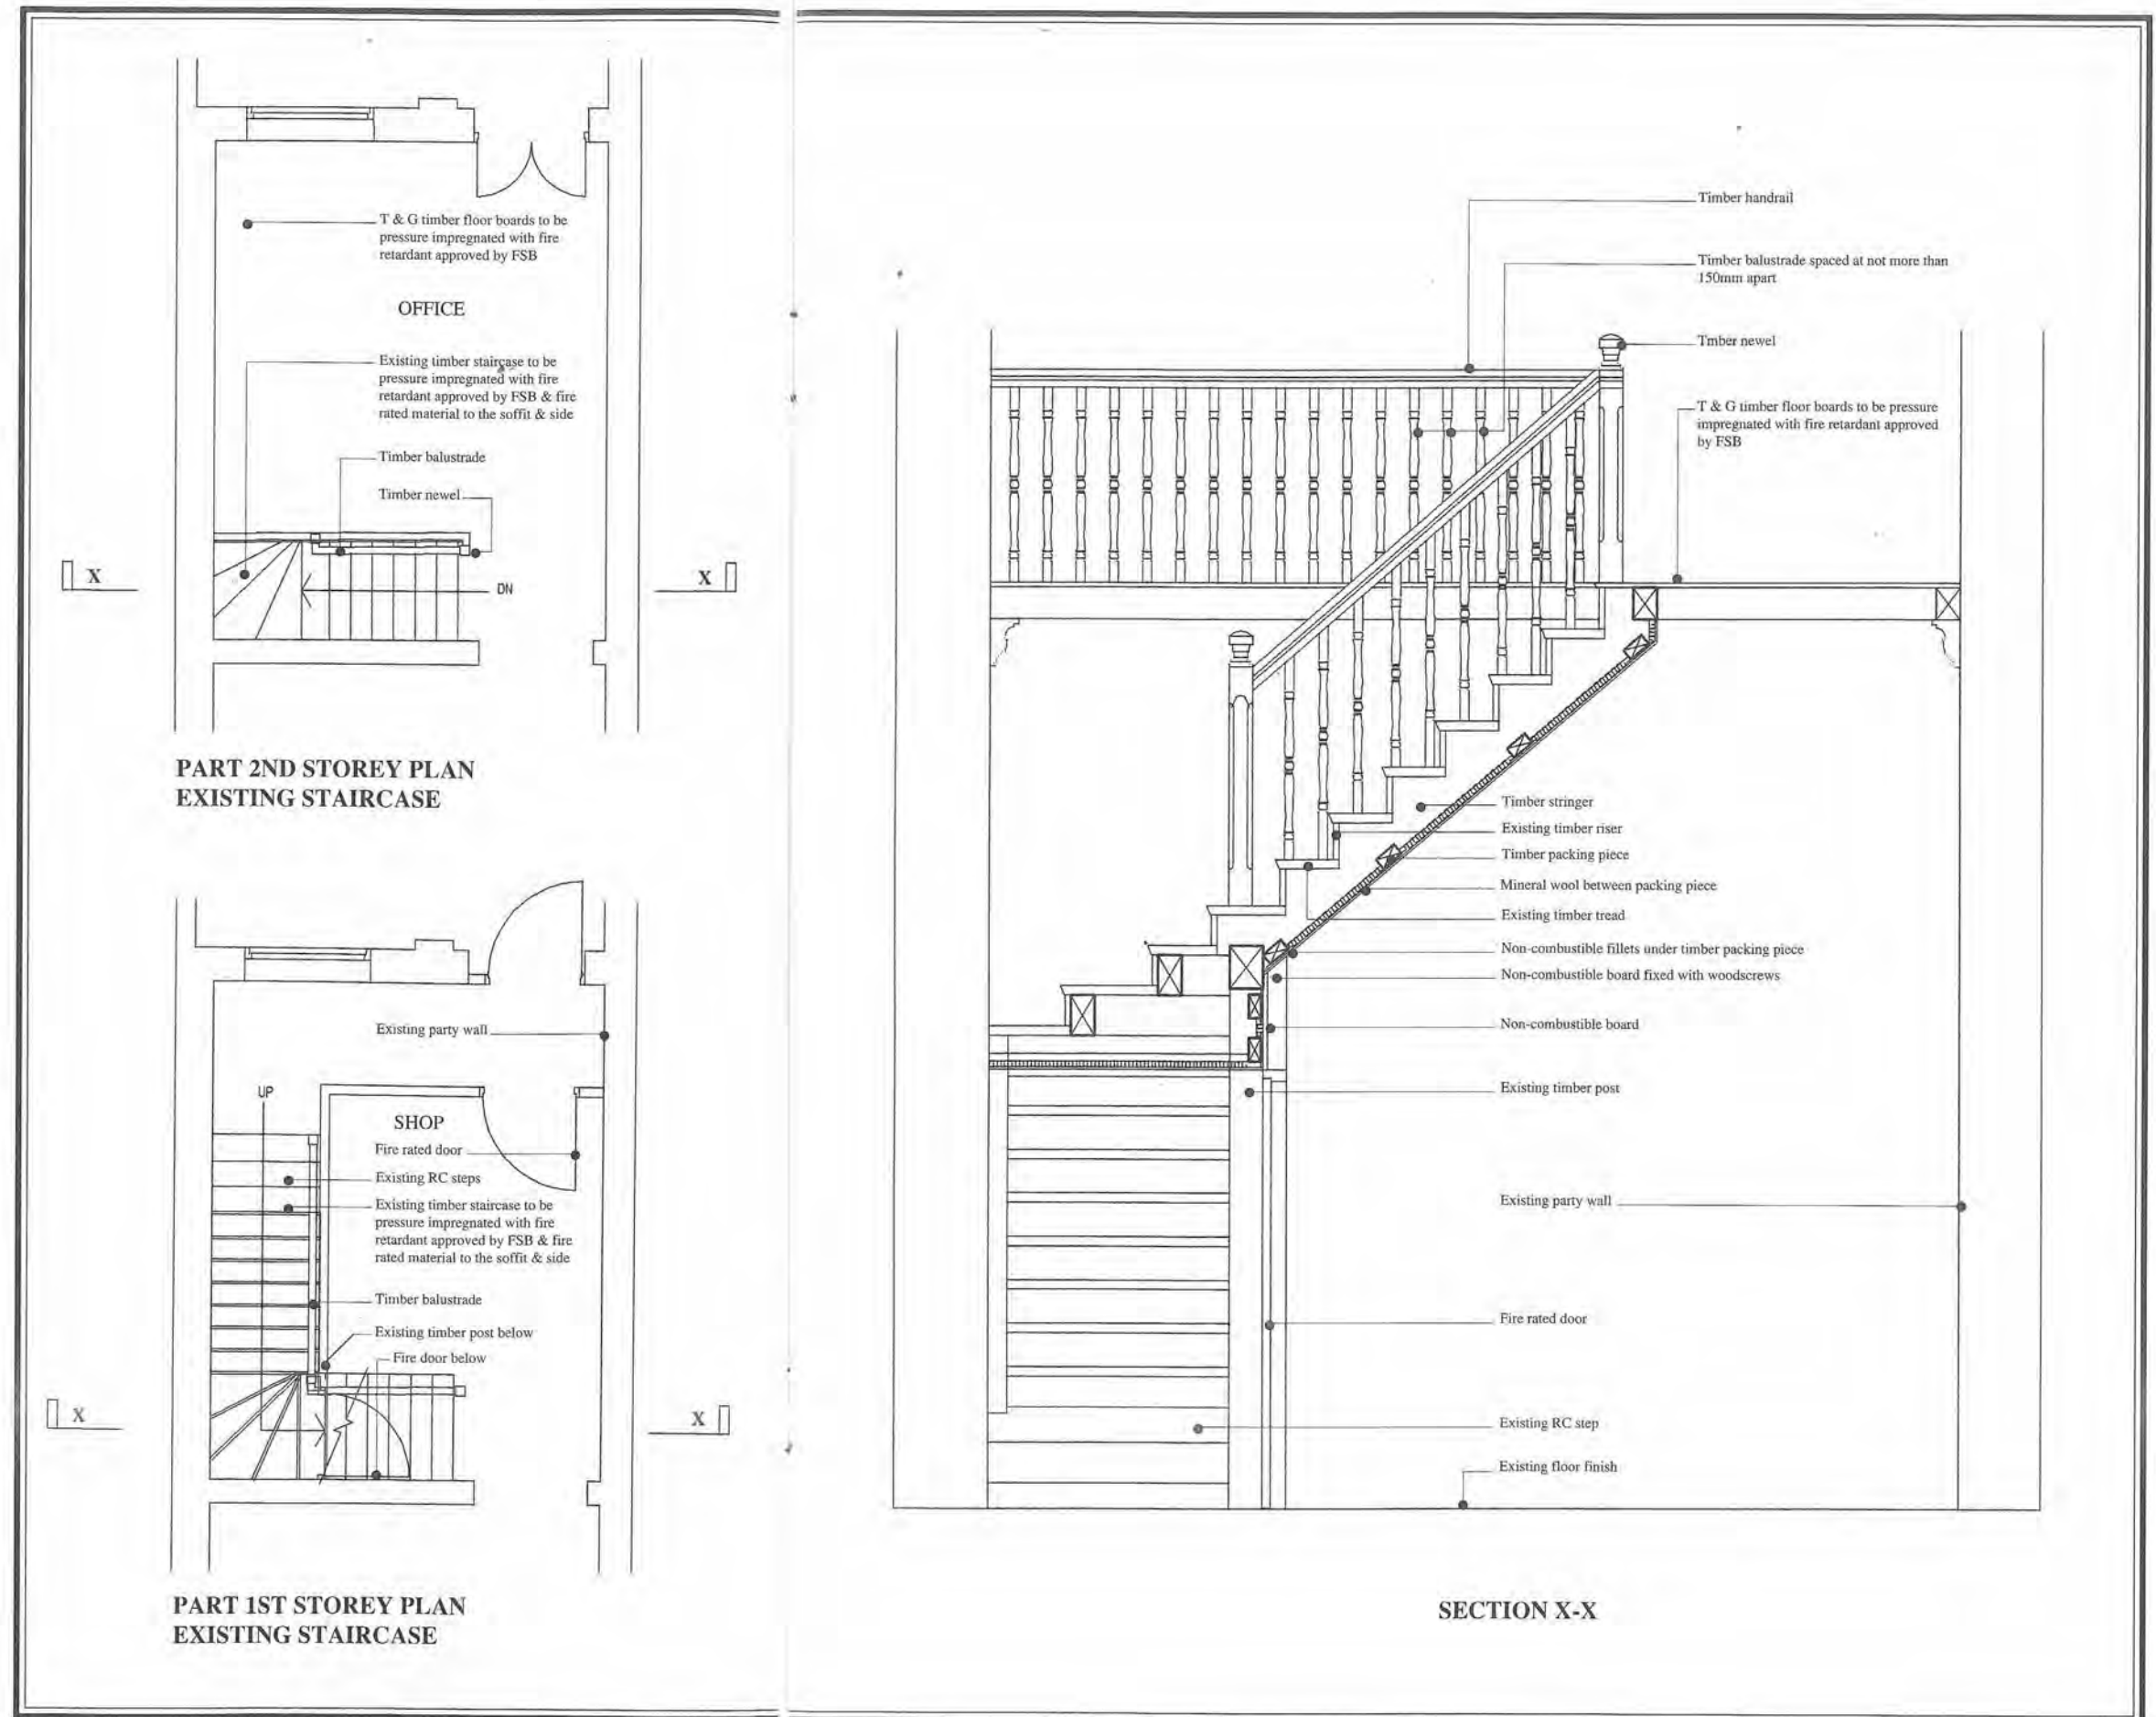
Plan and Section of an existing staircase which has been retained in its original position, and complies with current building codes.
